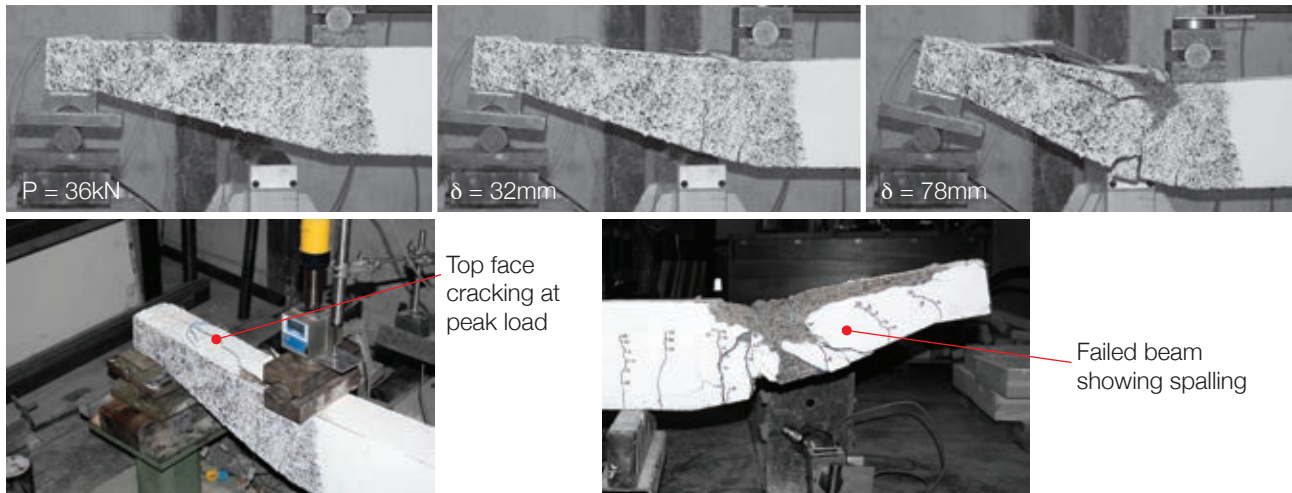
Failure of Beam 9\_2\_STM\_2(iii).
